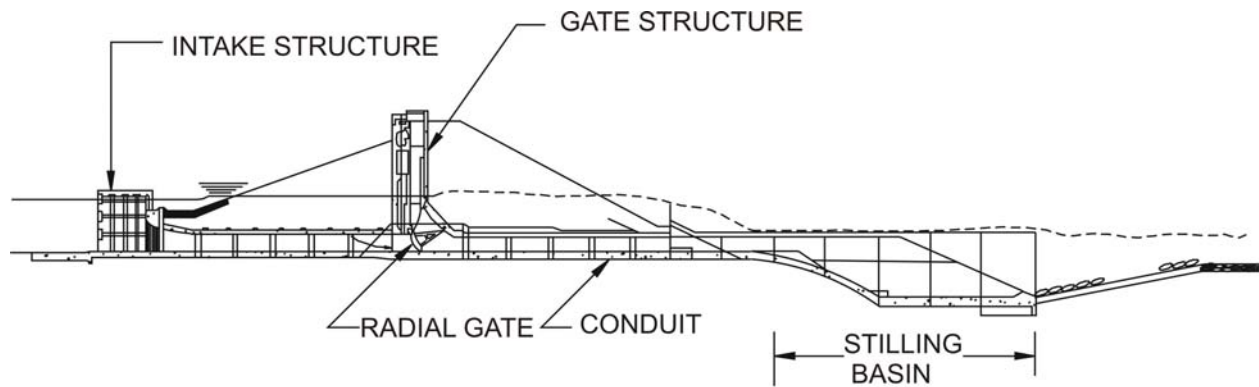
OUTLET WITH A TRASH-RACK BOX INTAKE,PRESSURE CONDUIT ON UPSTREAM AND FREE FLOW CONDUIT ON DOWNSTREAM
